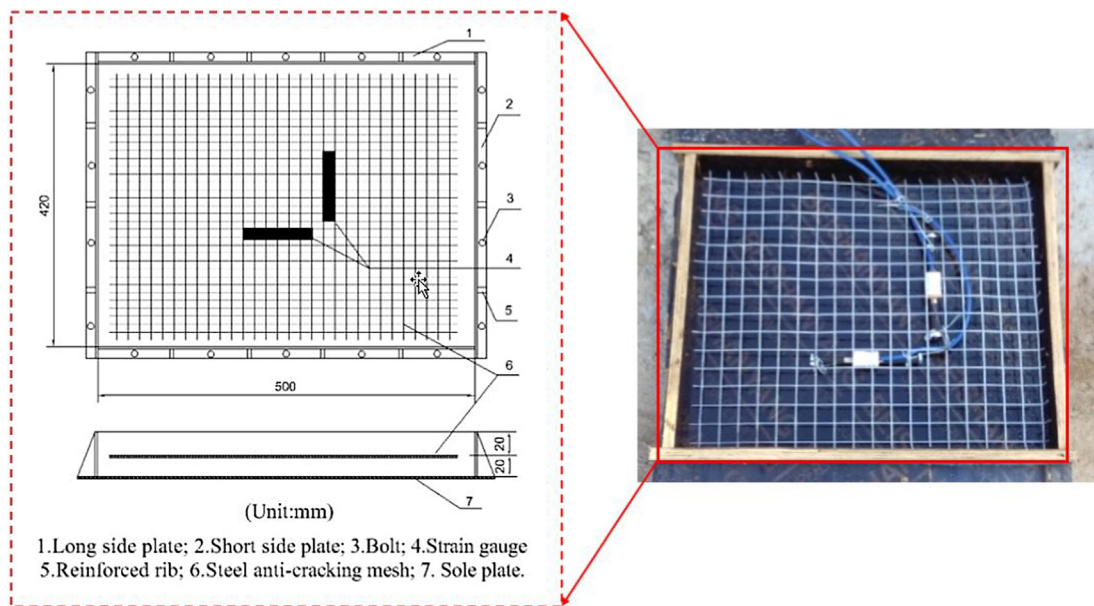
Schematic illustration of the precast concrete slab used in the tests.
